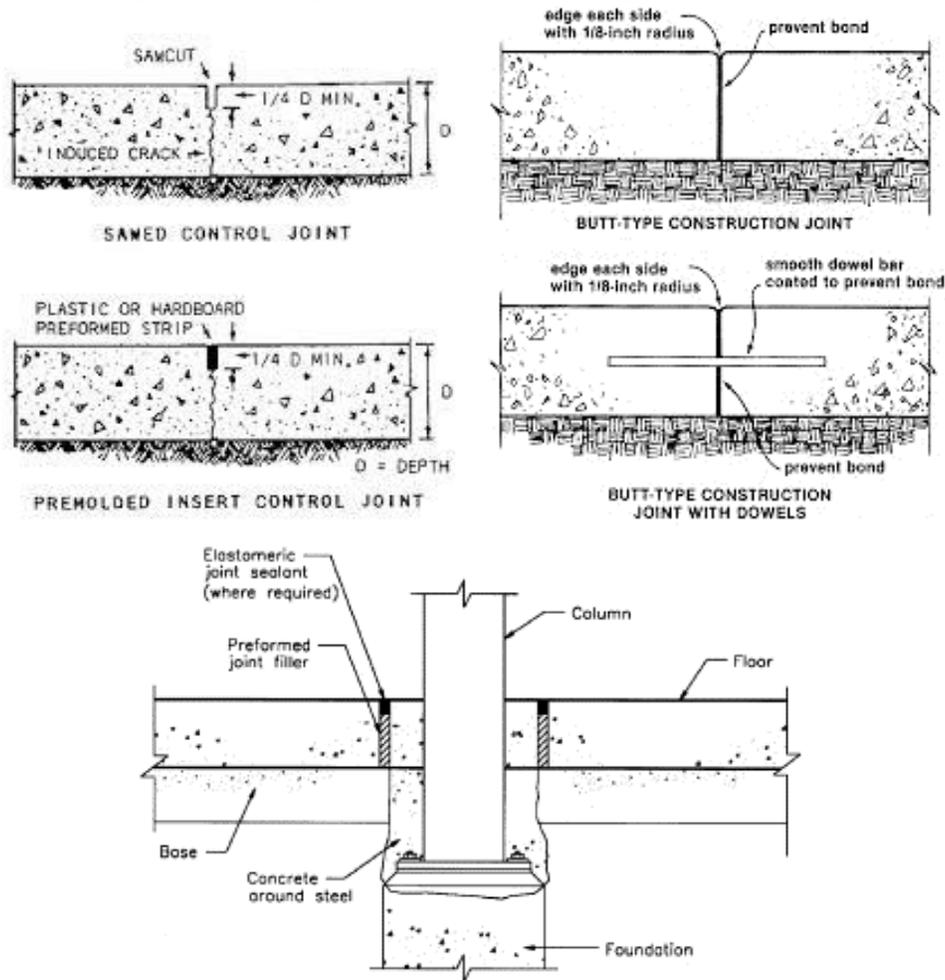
Slab on Grade joint types: control (left), construction (right), and isolation (below)
